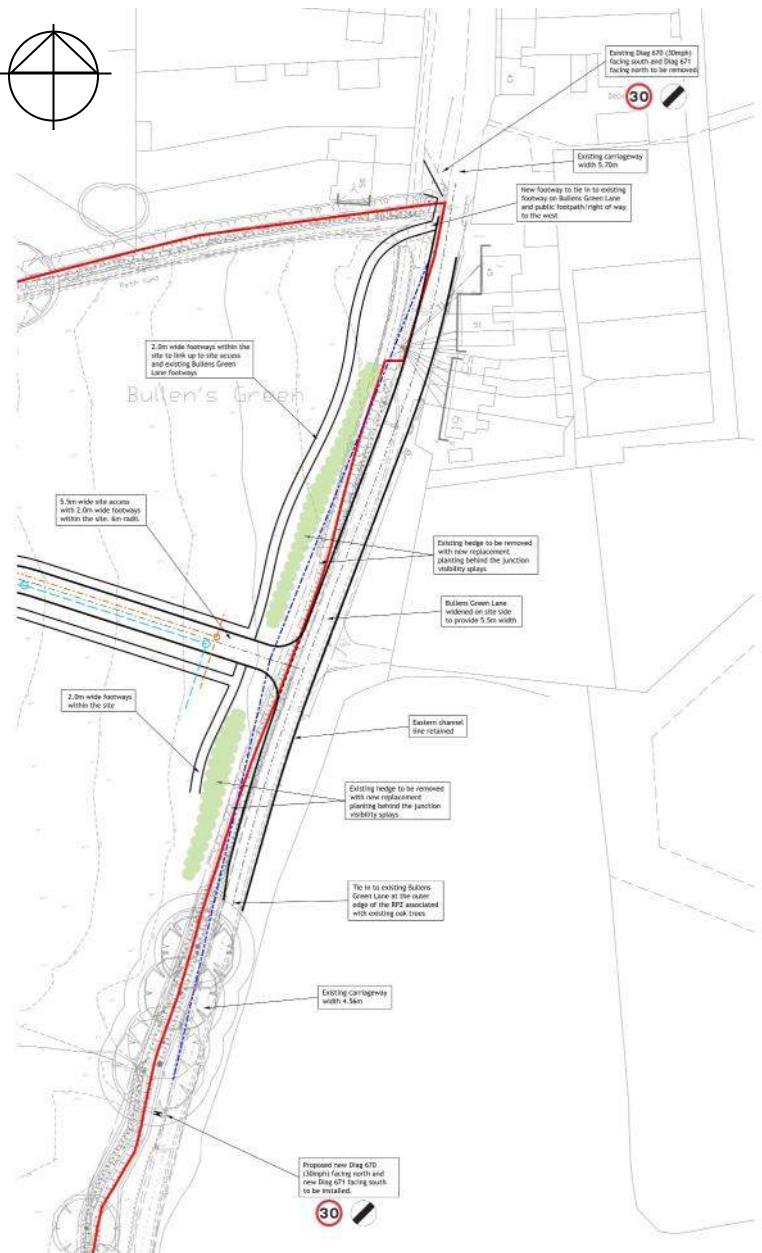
Proposed Site Access Plan (Access off Bullen's Green Lane)
